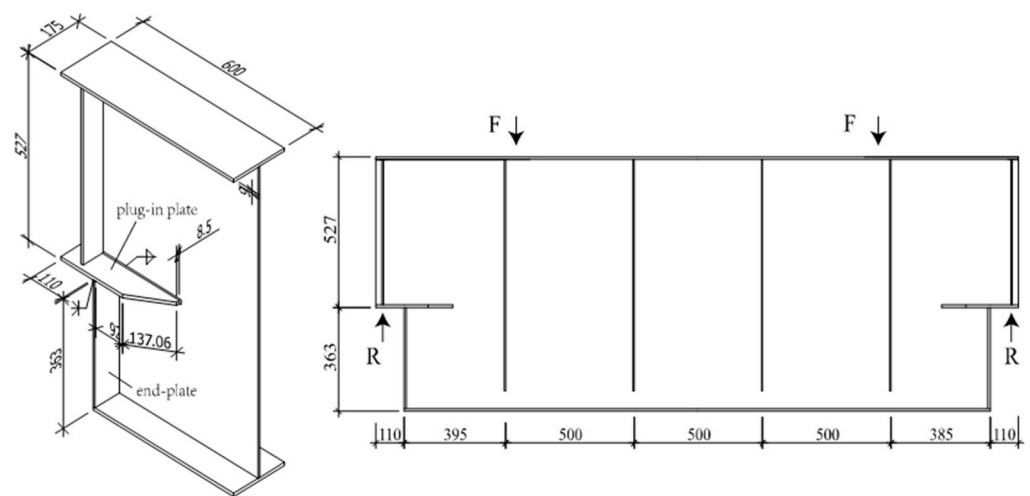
Dimensions of the variable-section supports with right-angle end plates.
